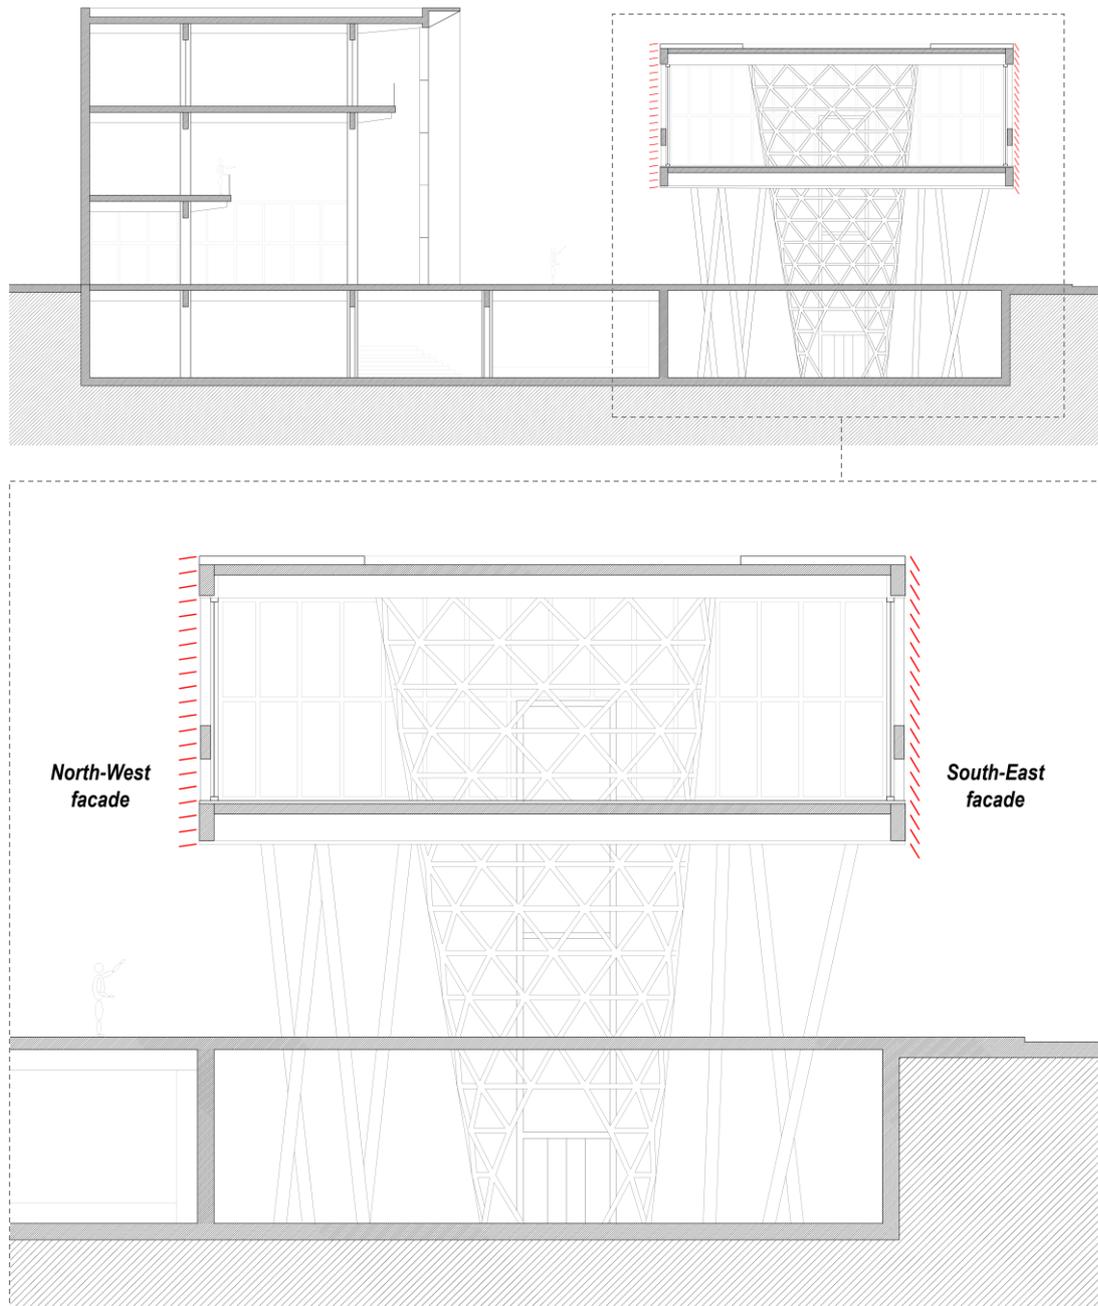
Cross section of the museum and the exhibition space, illustrating the individual performance of horizontal louvered shading panels on South-East and North-West façades.
